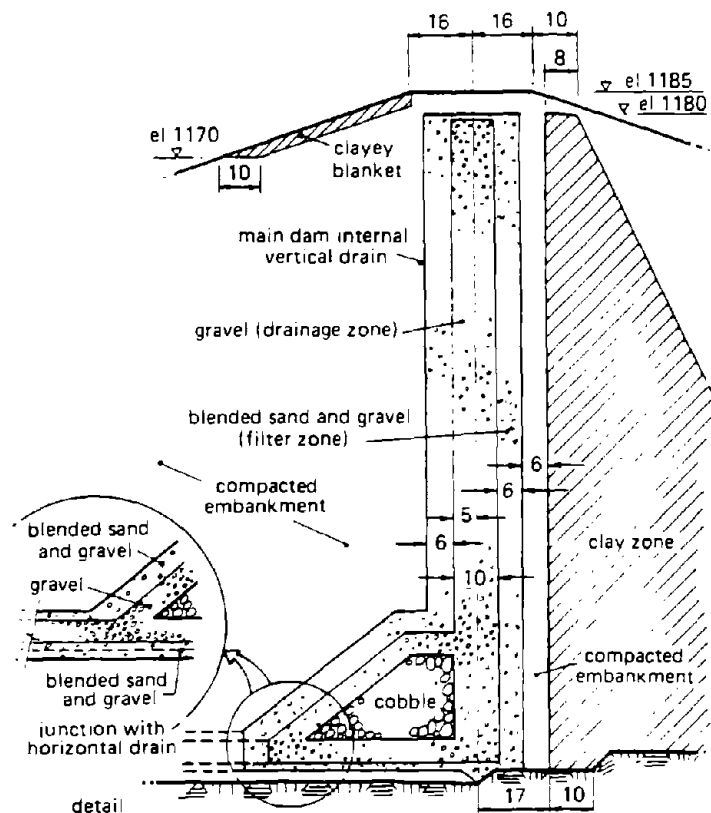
SECTION AND DETAILS OF THE DRAINAGE SYSTEM OF THE LOS ANGELES DAM (after Leps, 1989)
